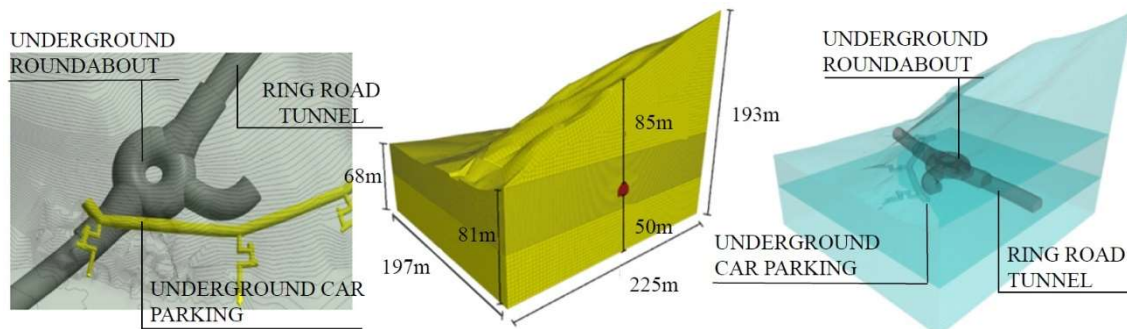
Roundabout and existing World War II anti-aircraft tunnel (yellow) layouts (left); 3D model (center) and transparent view (right) of roundabout and existing anti-aircraft tunnel (Barovero et al. 2023a, modified by the authors).
